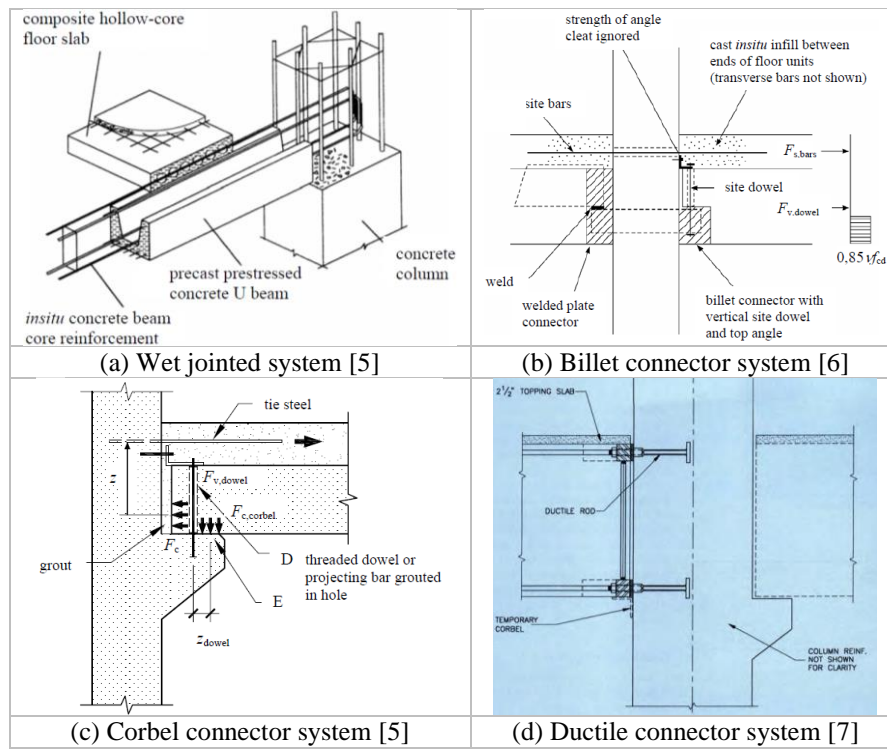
Examples showing different beam column connection options for a precast concrete frame
